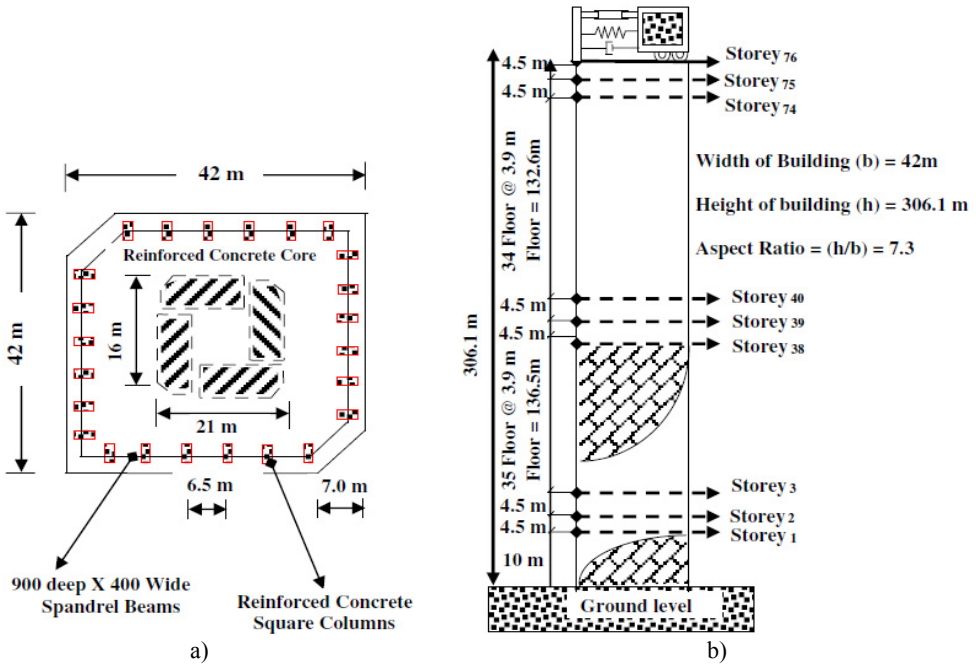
a) A Plan section, b) elevation view of 76 stories benchmark building
